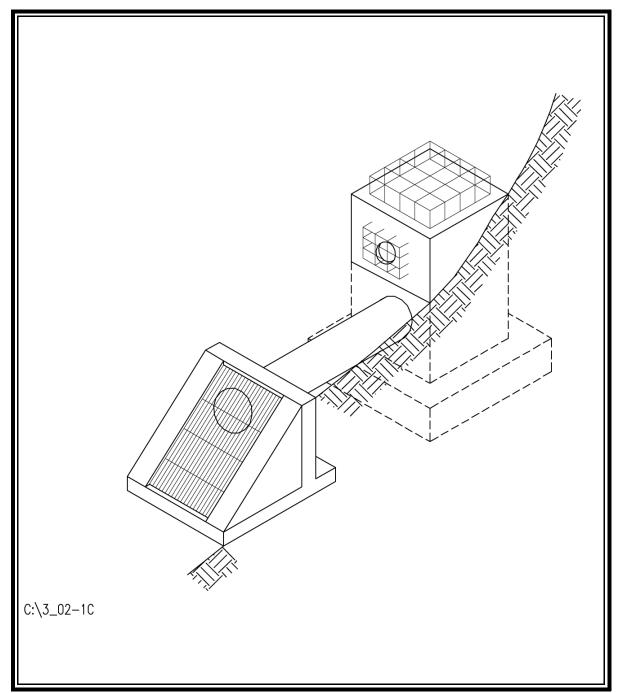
1d Typical Principal Spillway Structures
